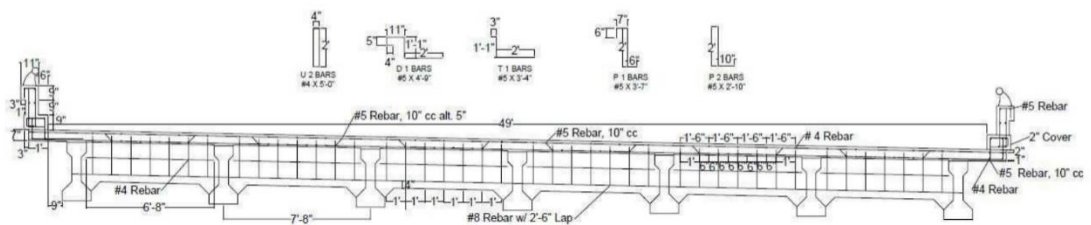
Whole section of the bridge section where girders A and C were taken [34]
